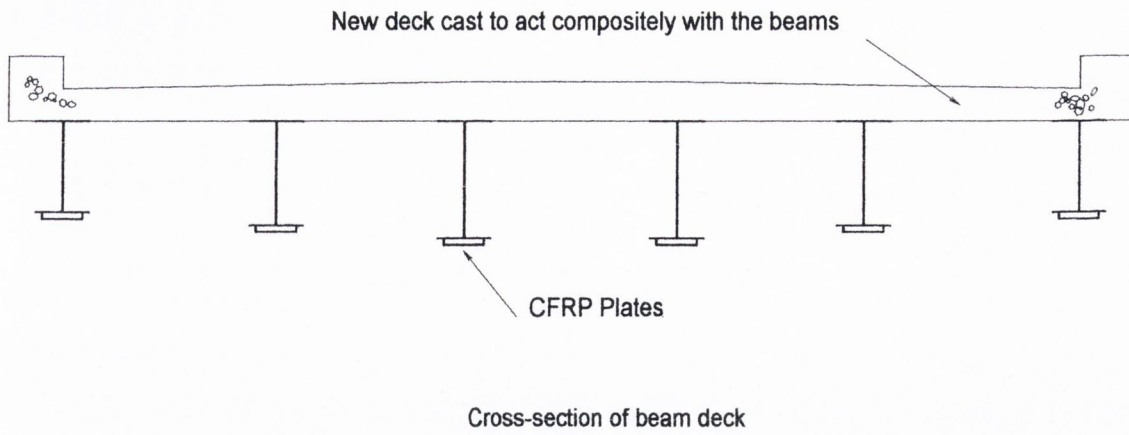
A cross-section of the bridge decking with the CFRP plates bonded to the underside of the lower flange of the beams.
